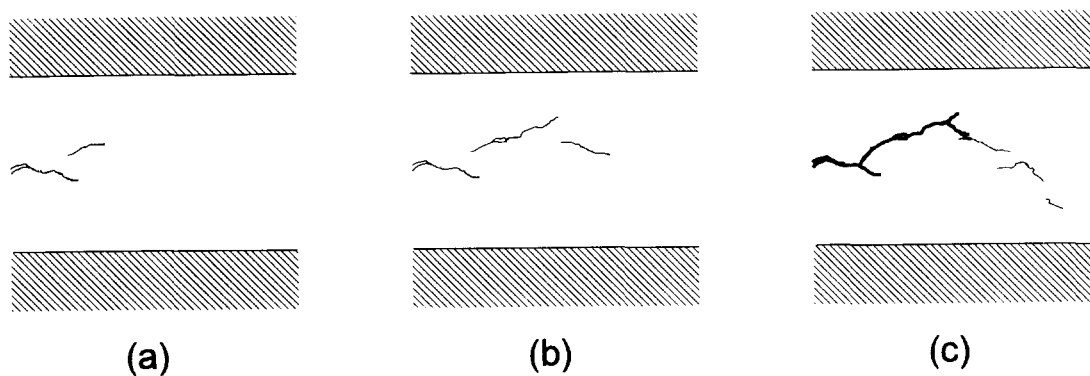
Typical crack propagation observed in mode I fatigue testing. From (a) to (b): stepped crack extension observed, (c) shows joining up of separate cracks into one continuous crack with more stepped extensions formed
